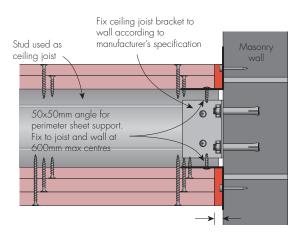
Non-Trafficable Ceiling to Masonry Wall
